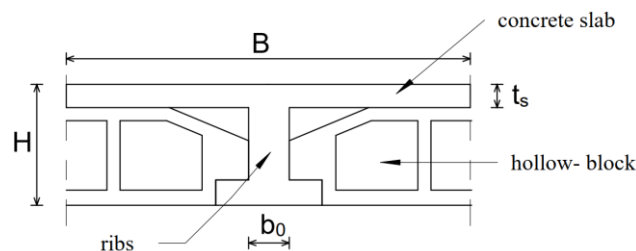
10. Transversal cross-section of a ribbed hollow bloc slab
